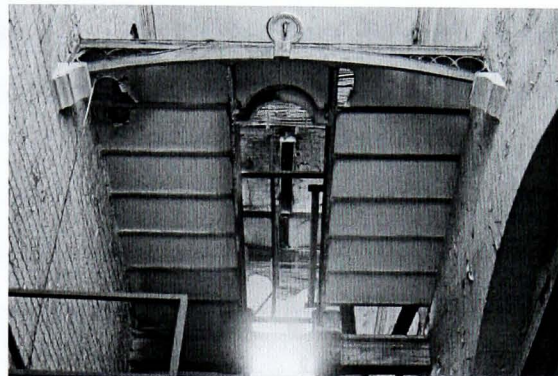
Surviving beam floor and entablature beam, Old Lane Mill, Northowram
